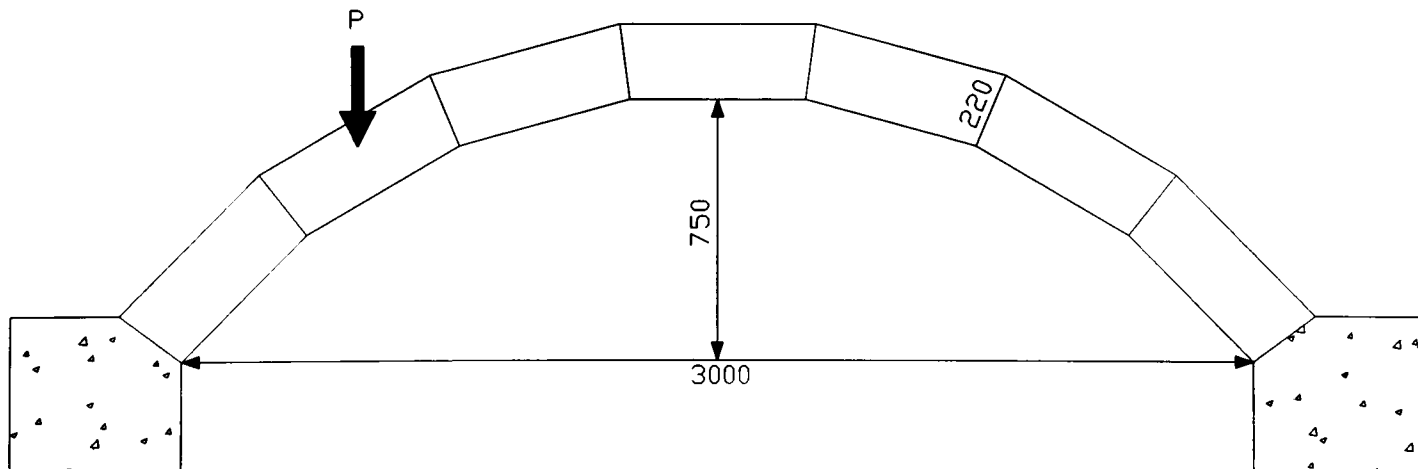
A seven block, 3.0 m span, voussoir arch
